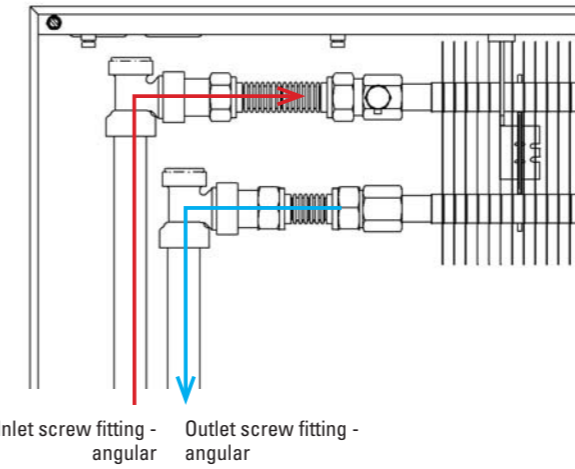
Side heating water connection - from the window (non-standard accessory - angular connection).
